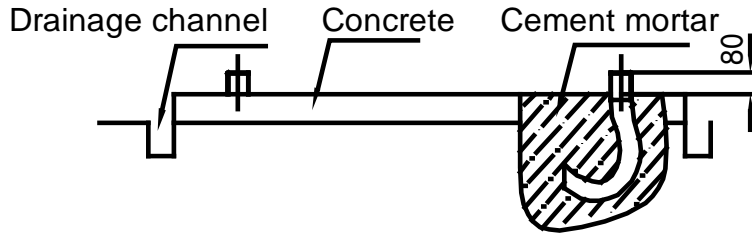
Outdoor unit typical concrete base structure design (unit: mm)
